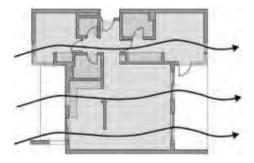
effective layout for an upper level corner dwelling/apartment.
